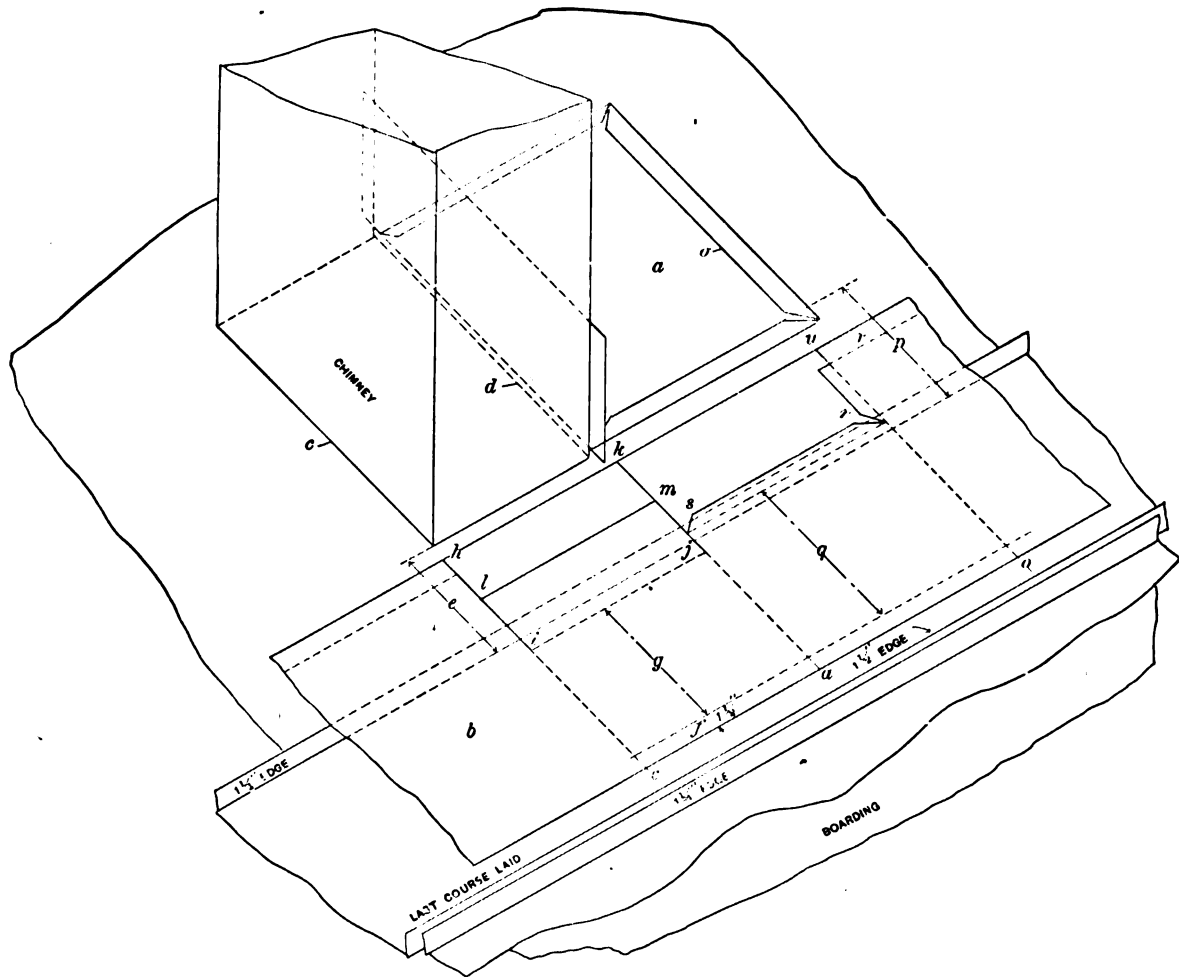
Laying a Standing Seam Roof Around a Chimney
